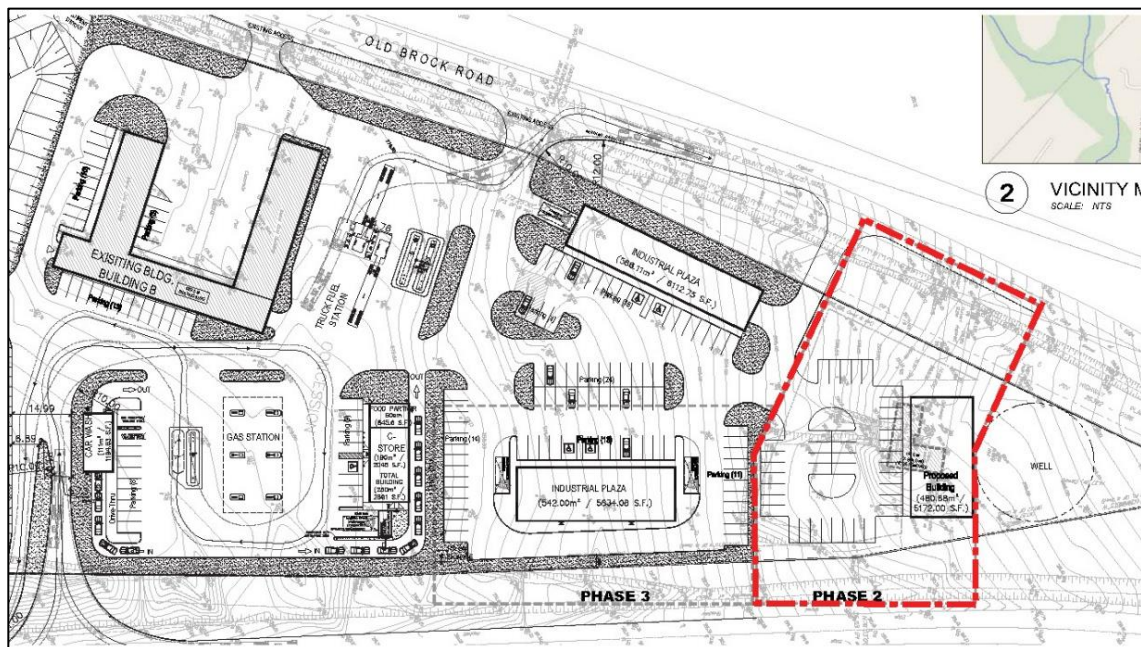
NORTHERN INDUSTRIAL BUILDING QUADRANT
